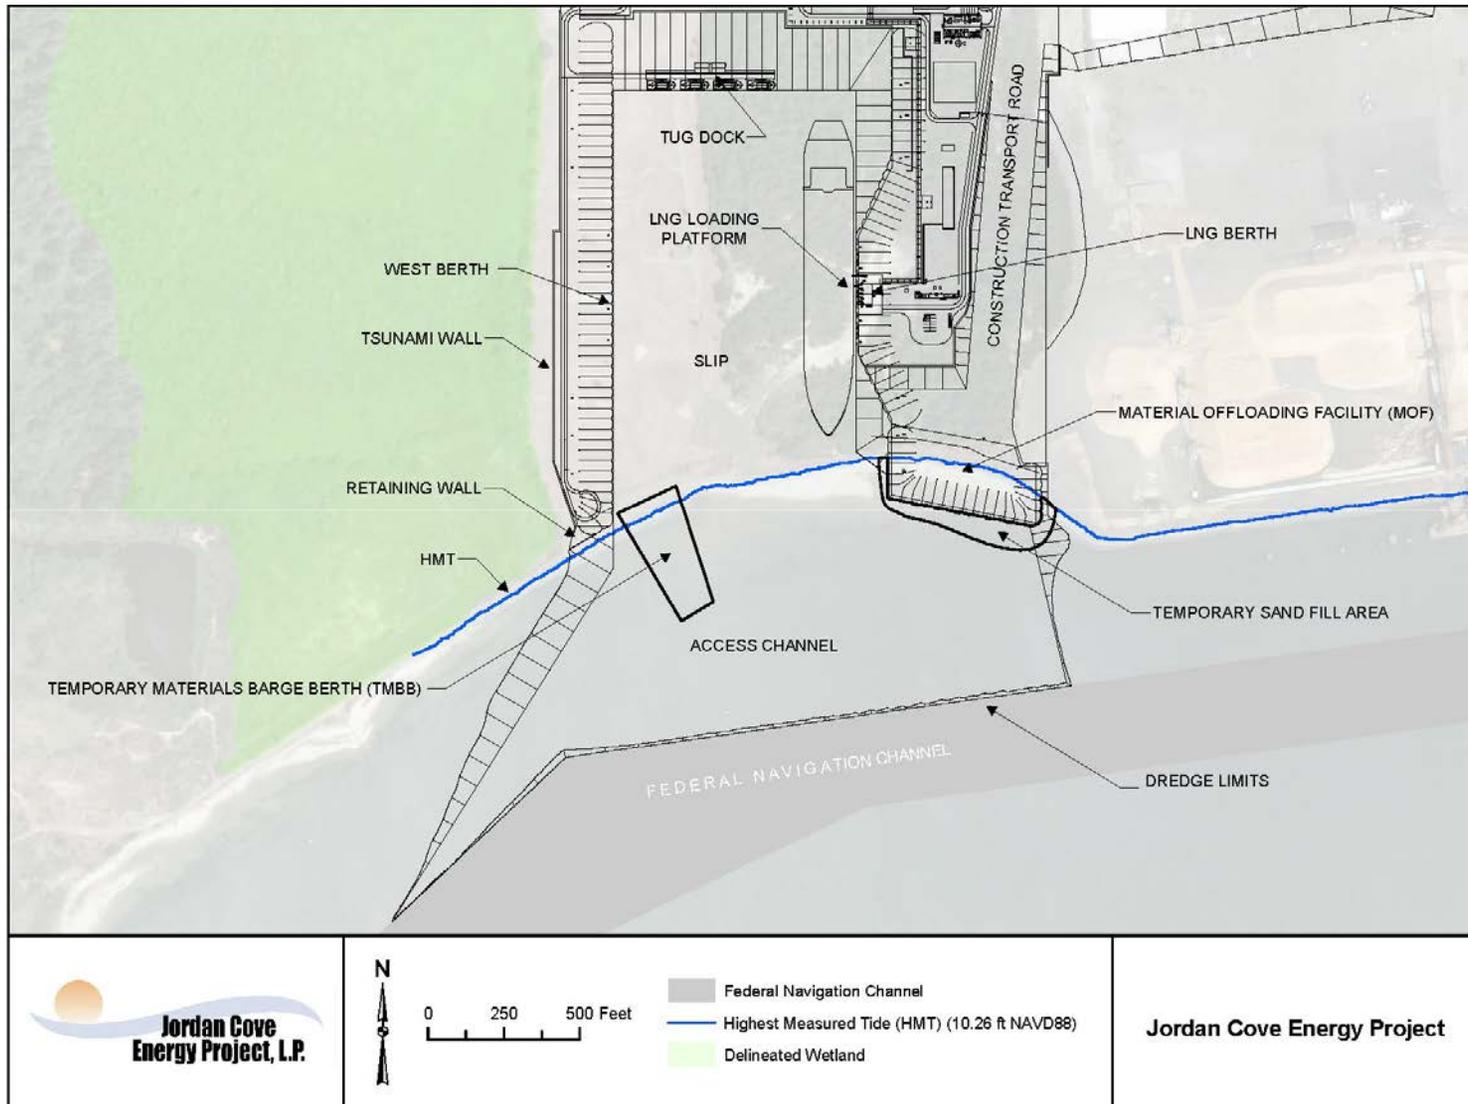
Plot Plan of LNG Terminal - Marine Facilities
